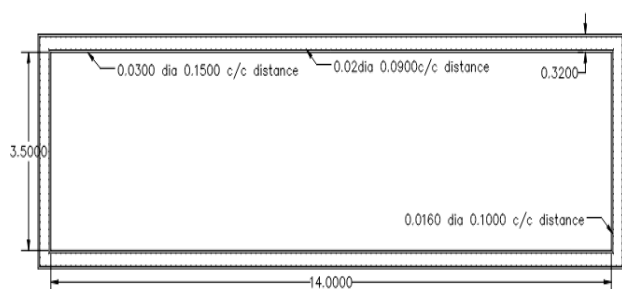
TOP SECTIONAL VIEW OF STORAGE TANK
